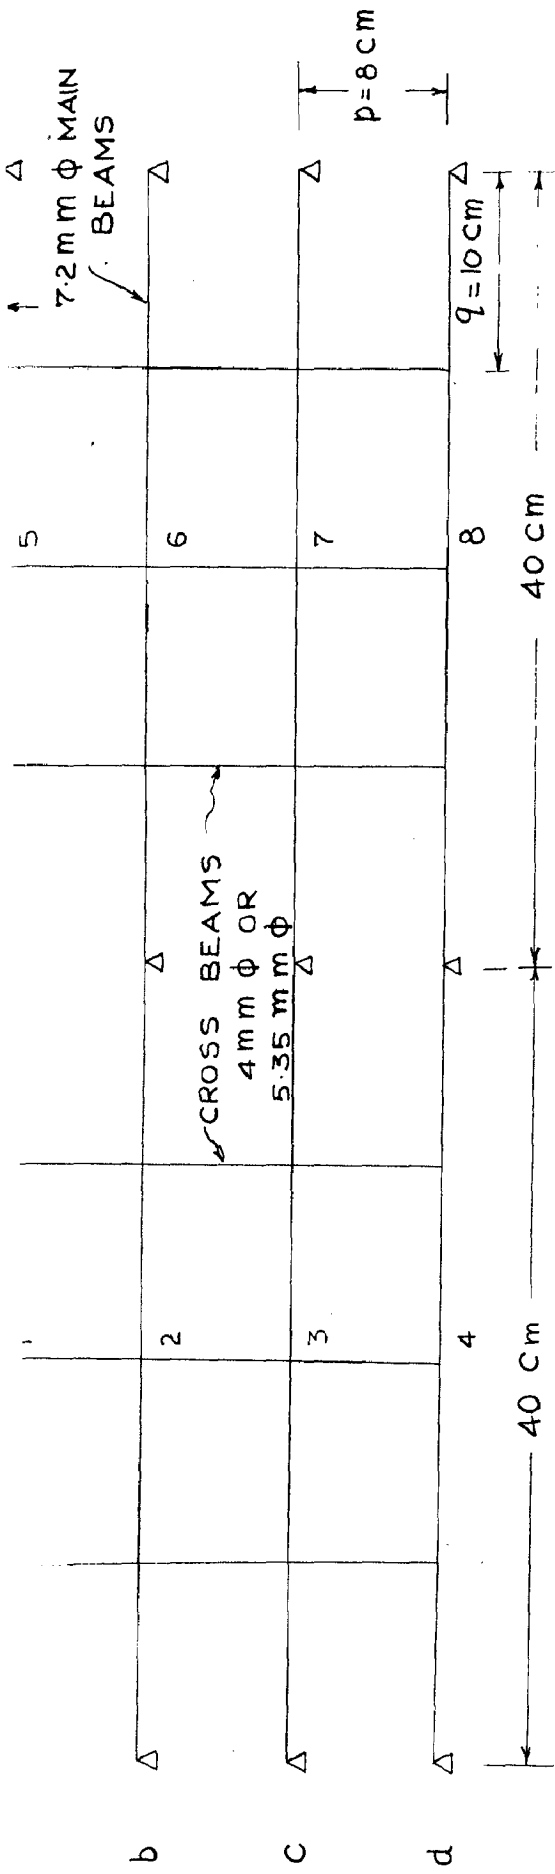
STEEL MODEL OF TWO SPAN CONTINUOUS BRIDGE GRILLAGE
